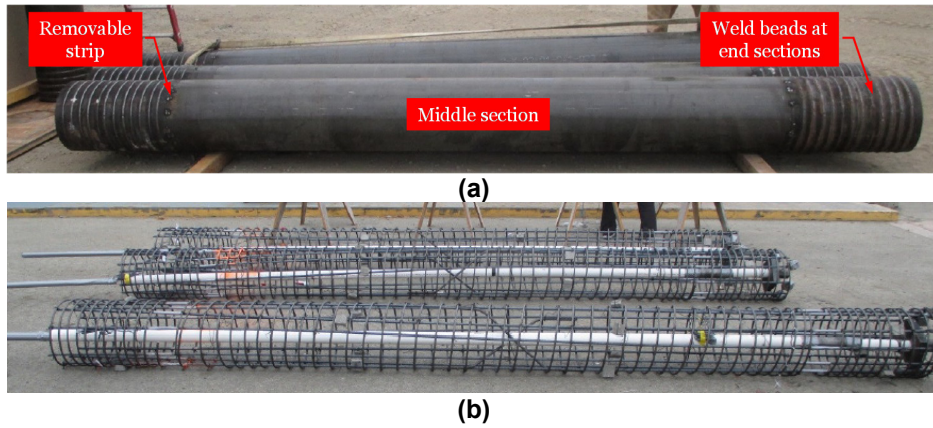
(a) Segmented column steel shells; (b) finished column reinforcing bar cages.
